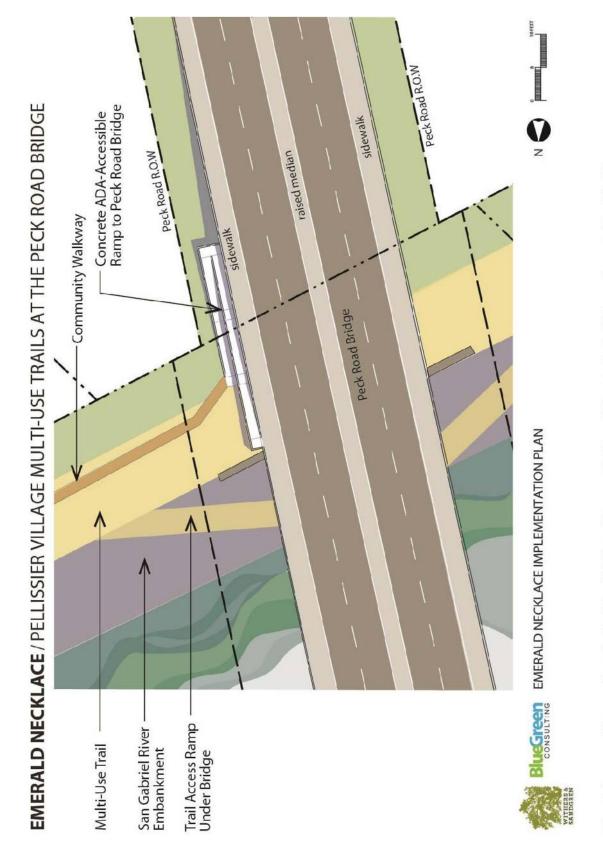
An accessible ramp from the Peck Road Bridge will connect Pellisser Village to the facilities on the west side of the River
